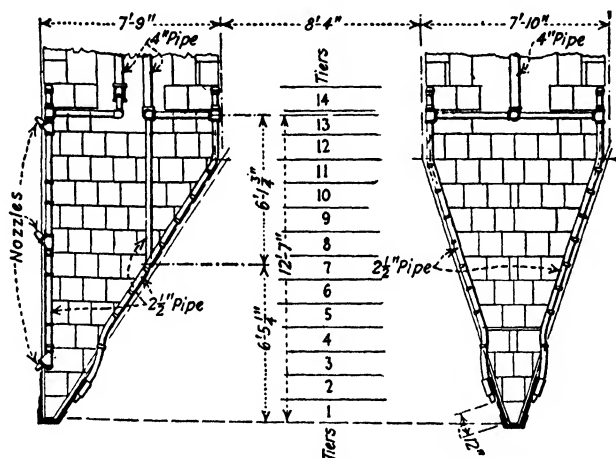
Jet Arrangement for Caissons of the Carquinez Strait Bridge.
